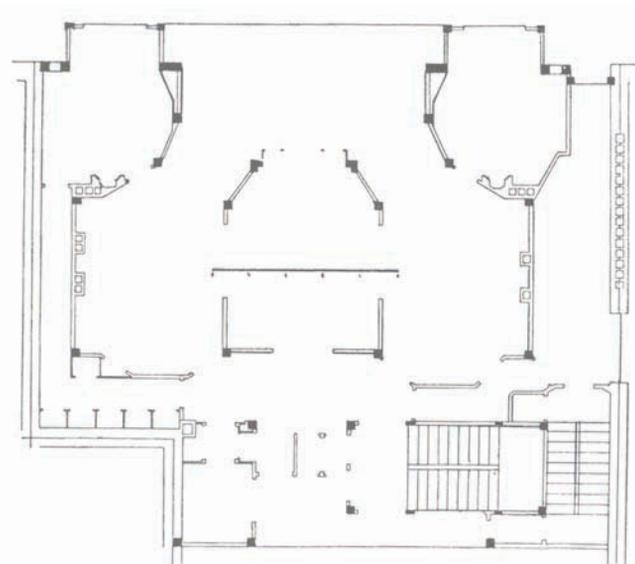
A. G. PERRET: RUE FRANKLIN, 1903. PLAN of a Story
